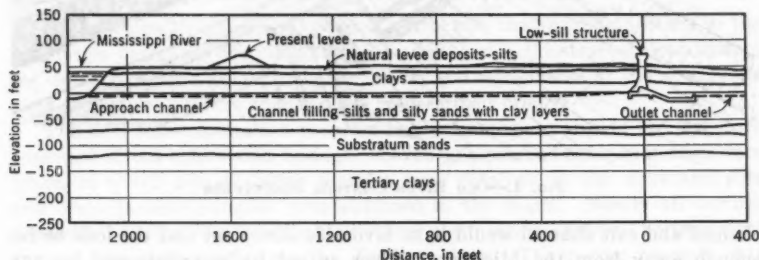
SECTION ALONG LOW-SILL STRUCTURE
